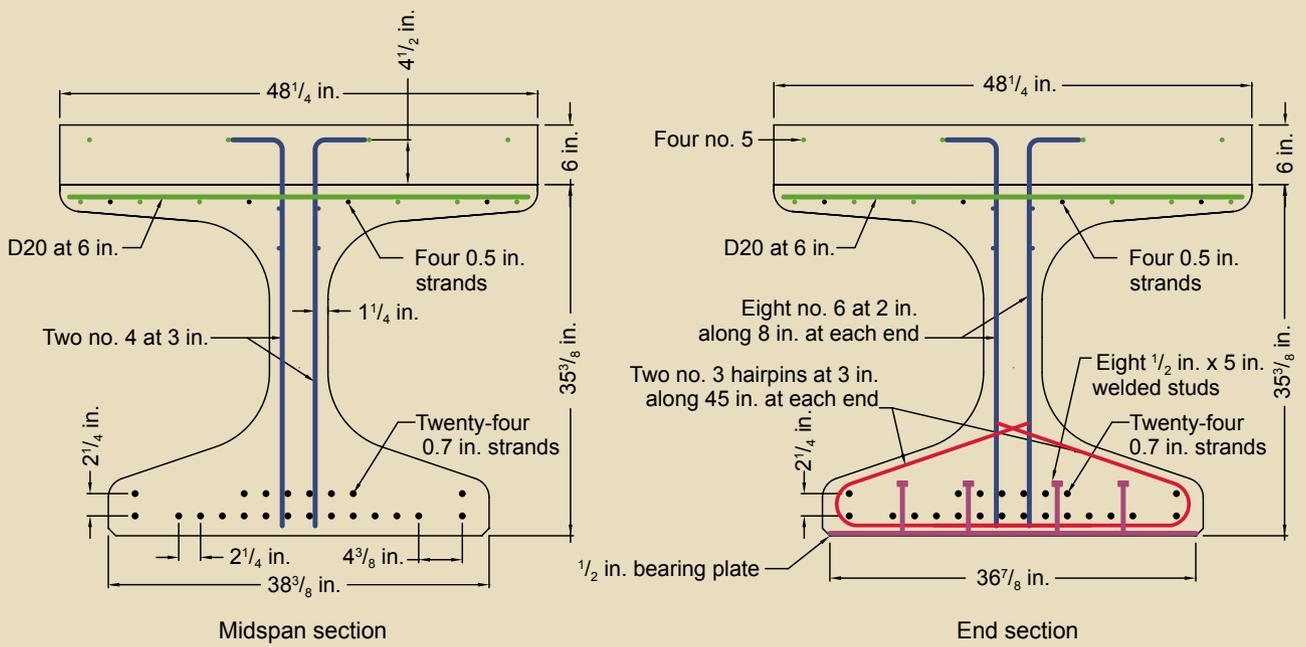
Girder A sections and reinforcing details. Note: no. 3 = 10M; no. 4 = 13M; no. 5 = 16M; no. 6 = 19M; 1 in. = 25.4 mm.
